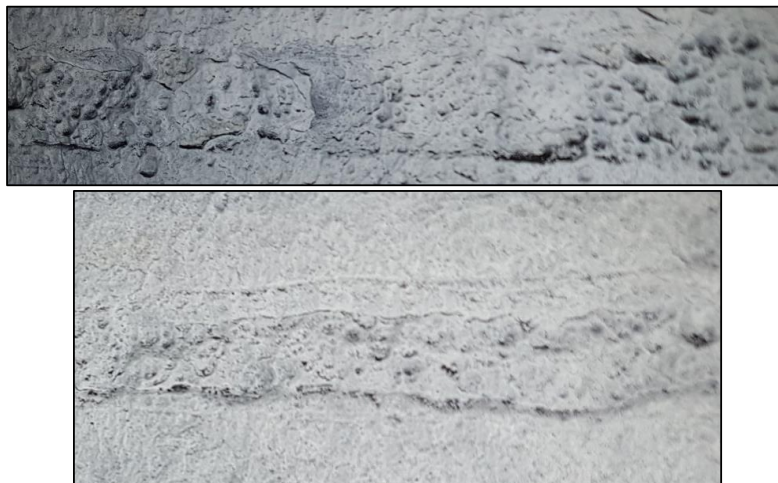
Longitudinal Seams in Penstock No.1 Section 16
